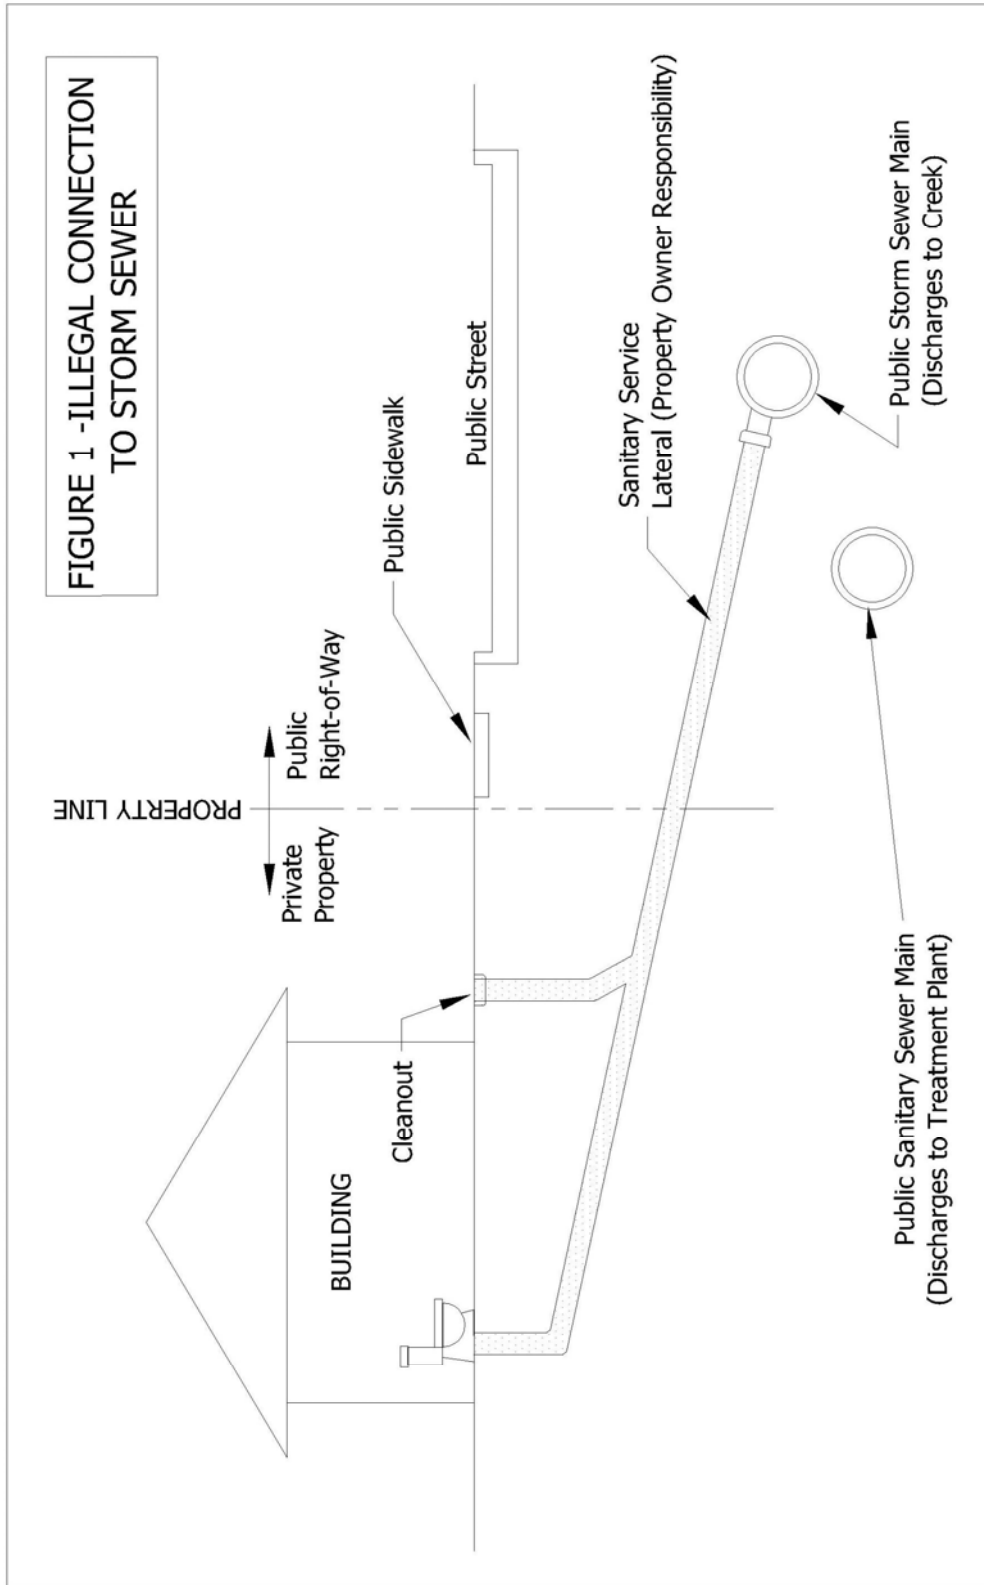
ILLEGAL CONNECTION TO STORM SEWER
